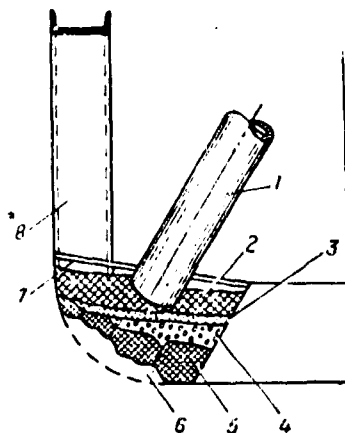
Concreting Under Water: 1- pipe for delivery of concrete; 2- layer of concrete; 3- layer of sand; 4- cinders; 5- sand bags; 6- hole; 7- form; and 8- side of ship.
